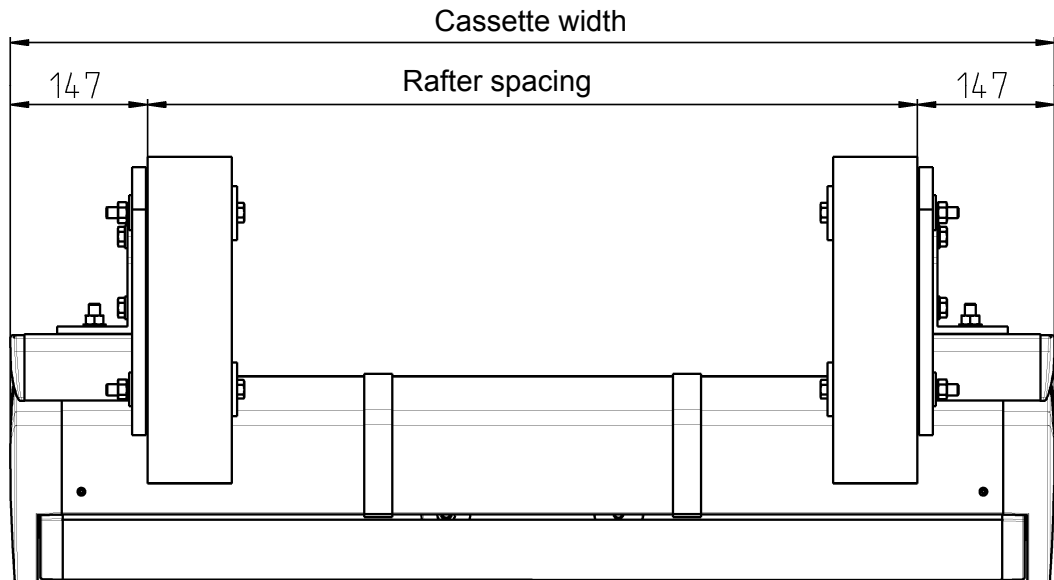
Standard rafter assembly with rafter bracket and mounting plate
